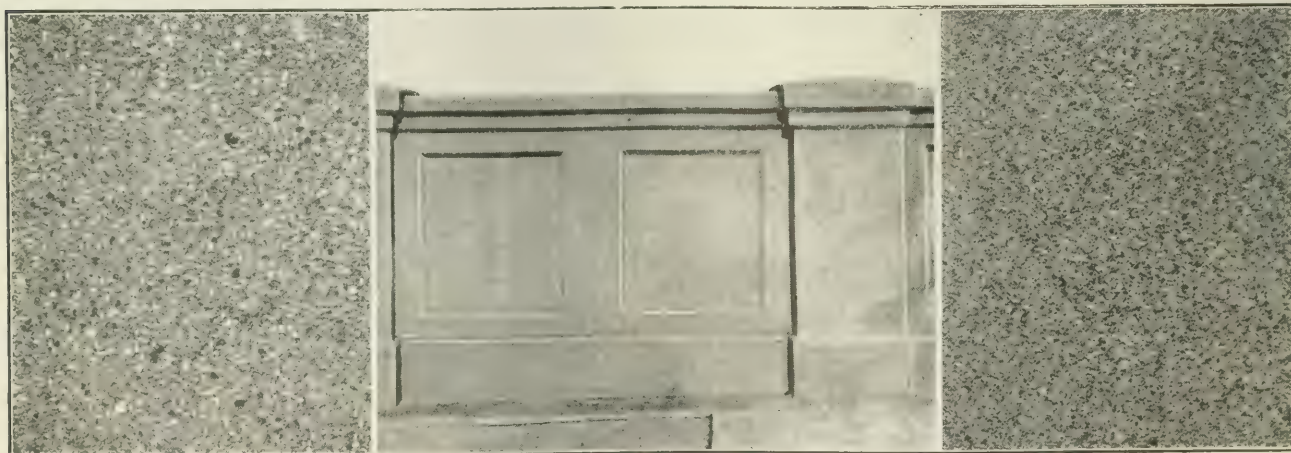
AND 2. TUNNEL FOR FOOT PASSENGERS UNDER RAILWAY AT EDGEWATER PARK
